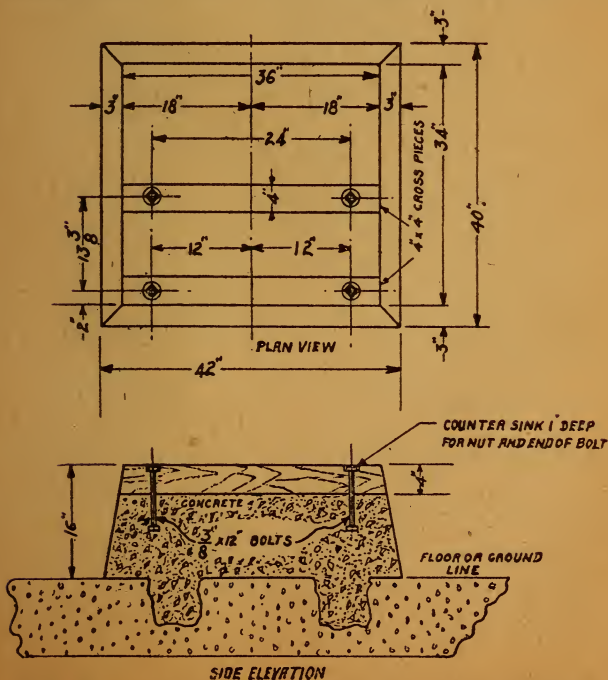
Concrete foundation with wood sills intended to absorb shocks.
